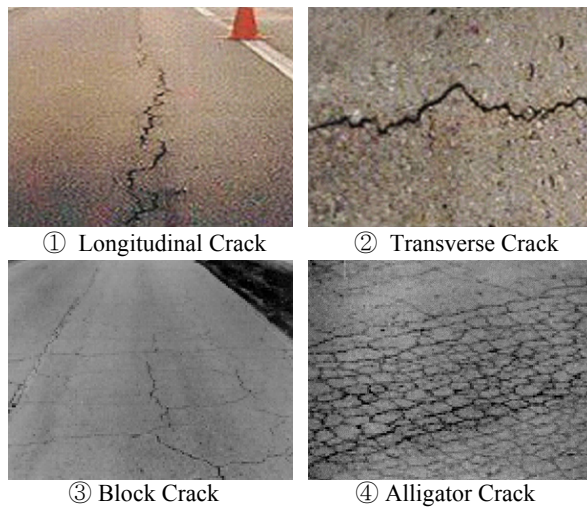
Crack Patterns on Asphalt Pavements
